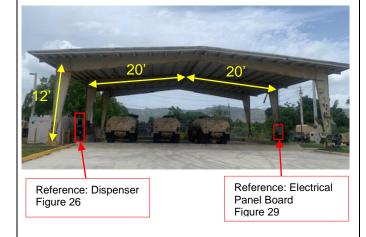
Front View (Above Storage Tank, Dispenser, and Canopy Area)
